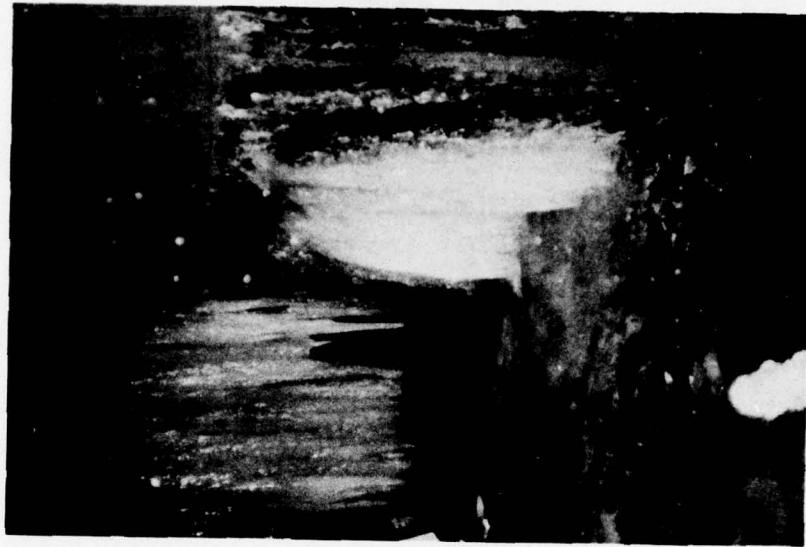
Typical view of construction joint leakage in riverwall filling and emptying culverts as portrayed by ice sheets.
